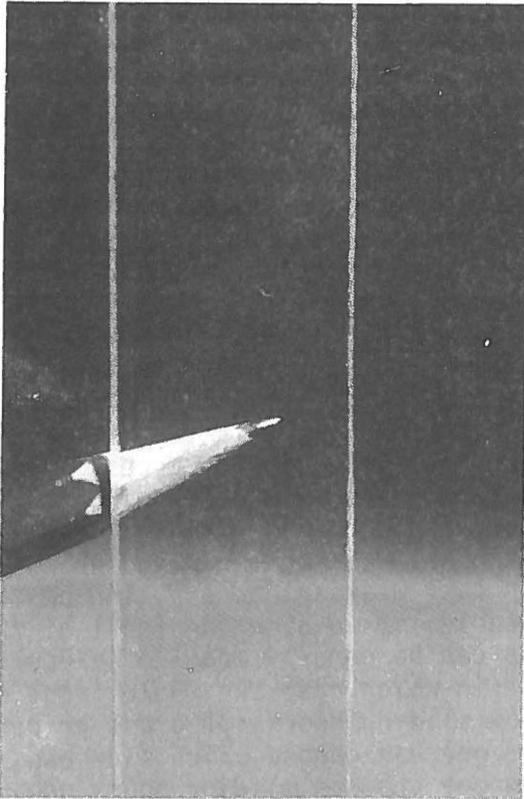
This picture shows how much space is left between the sliding doors when 3 mm glass is used in a so called 3 mm rail. Foto: Ulf Olsen.
